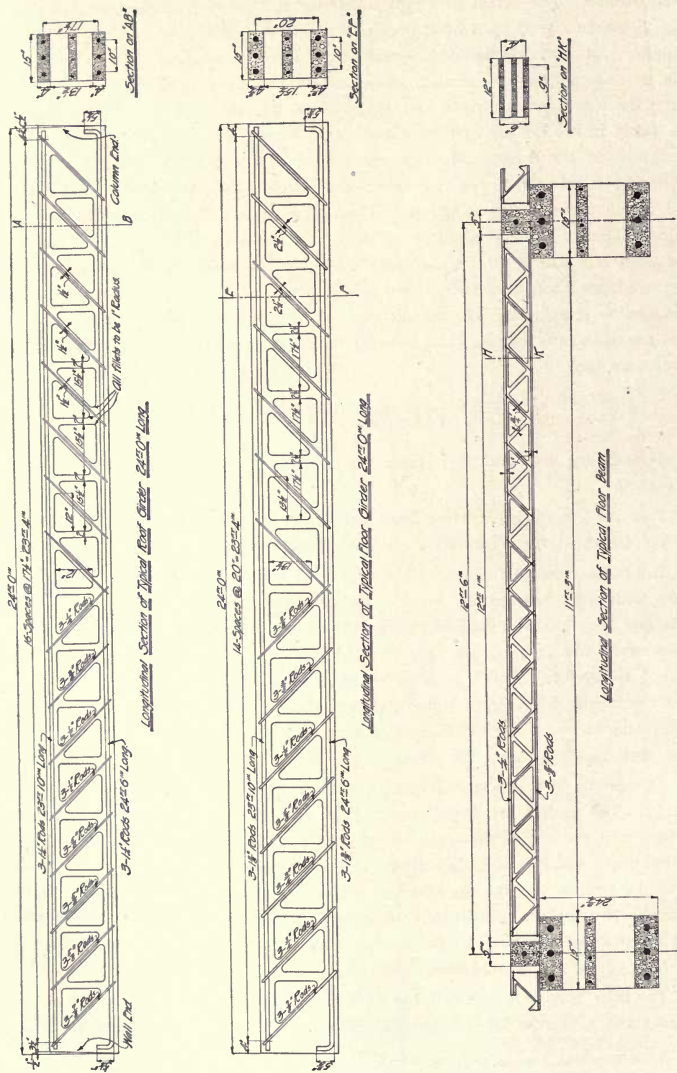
Details of Visintini Girders and Floor Beams. (See p. 151.)
